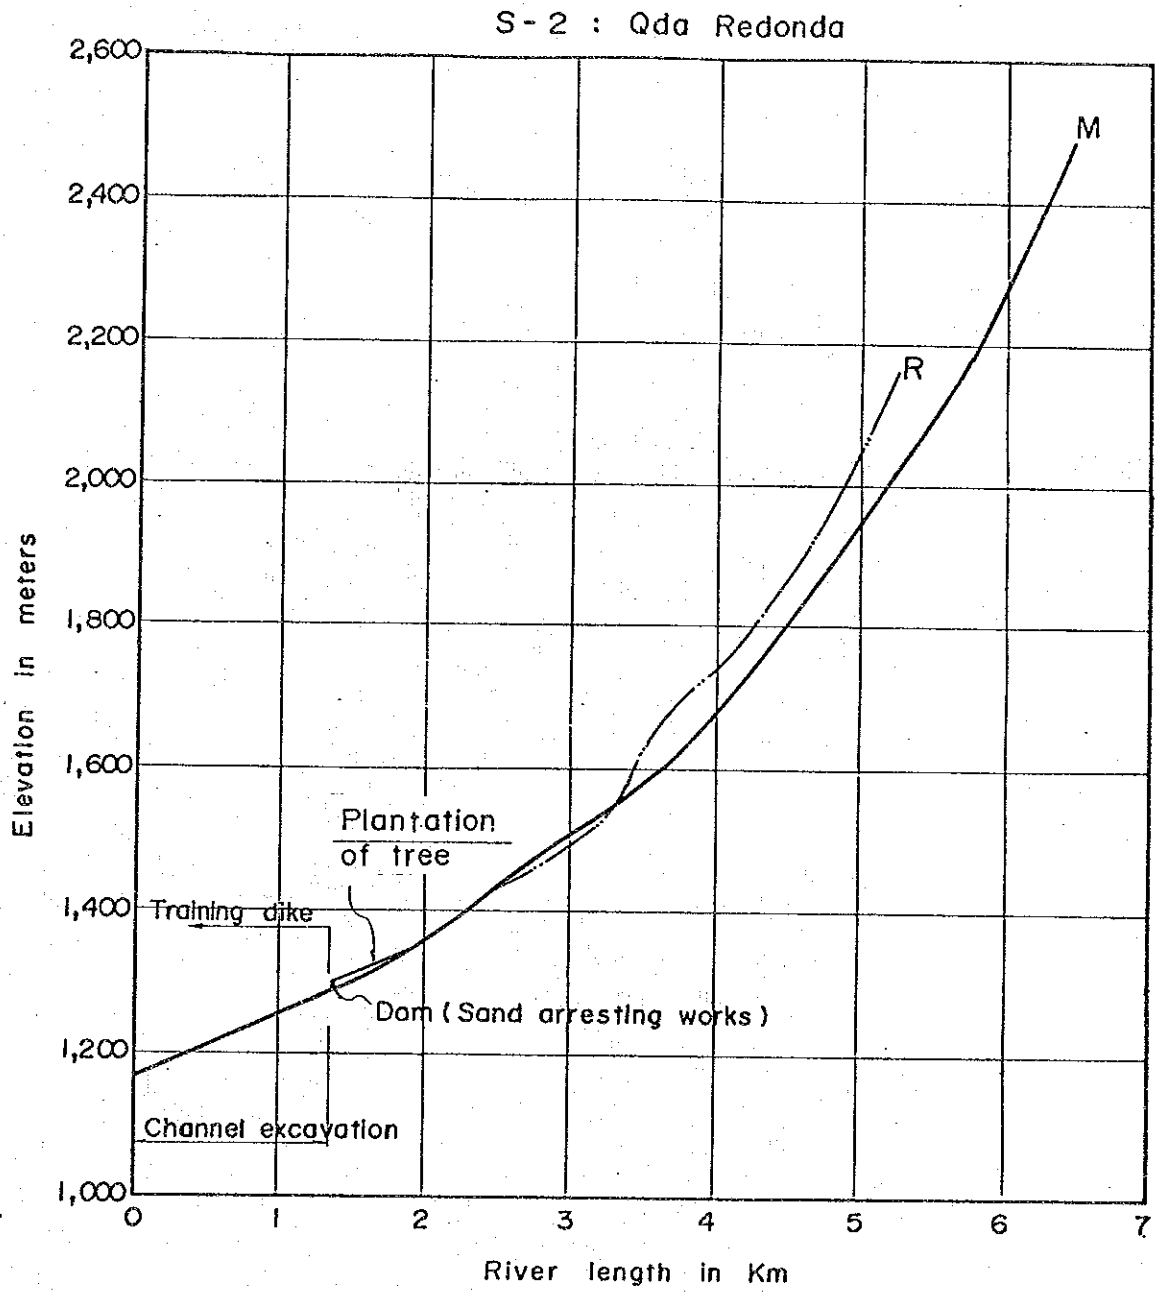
Structural Plan on Profile of Qda Redonda (S2)
